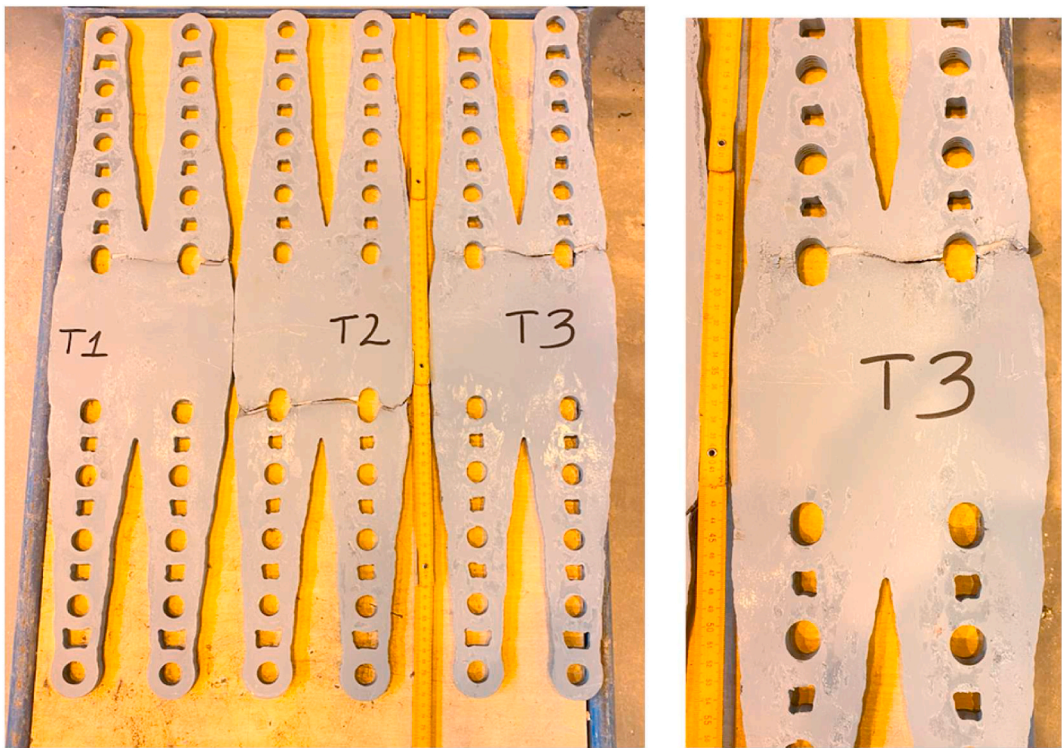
Failure of specimen T3 (tensile plate) extracted from the testing machine.
